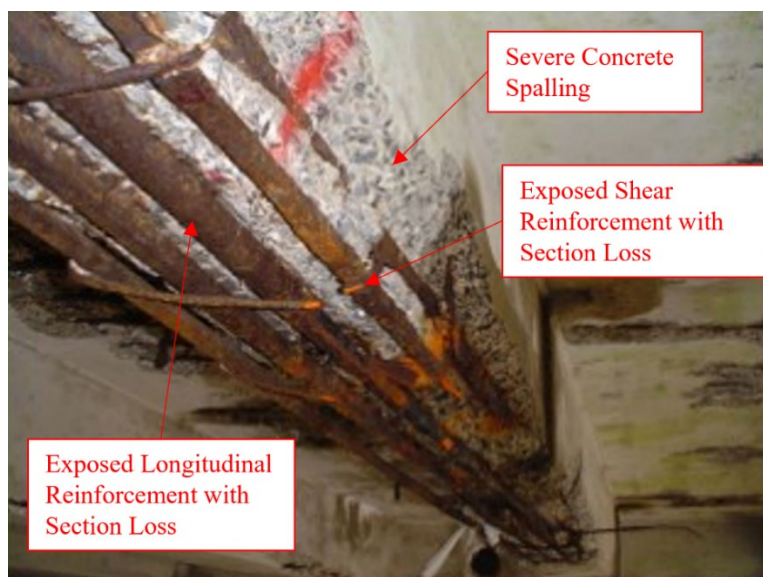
Heavy Spalling and Exposed Reinforcement in a Reinforced Concrete T-Beam
